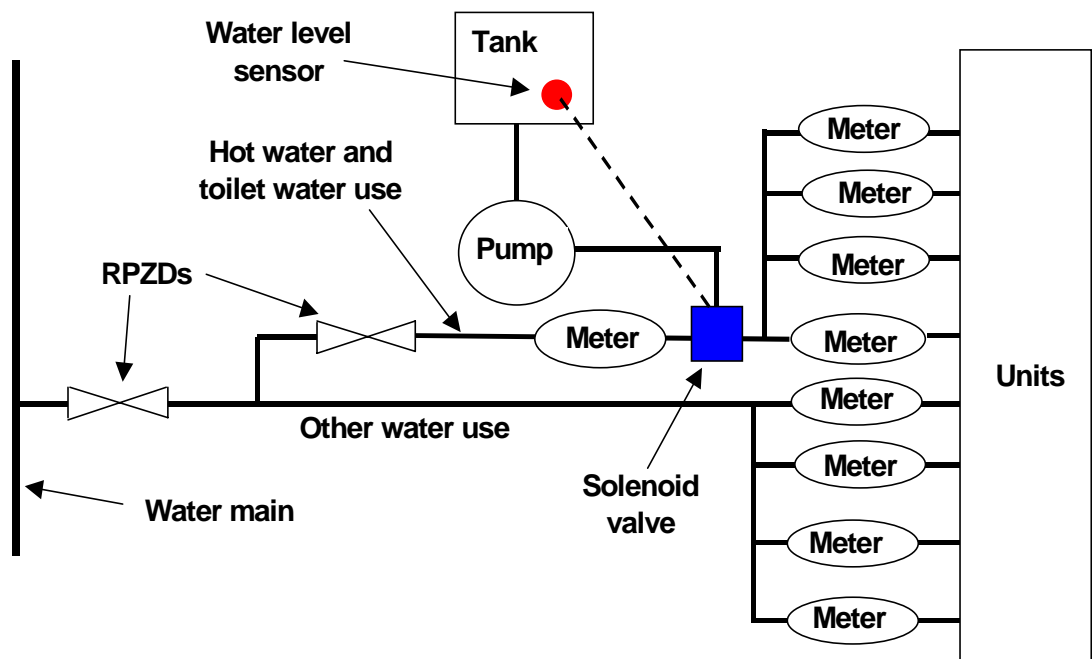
A schematic of the plumbing and metering system at Figtree Place
